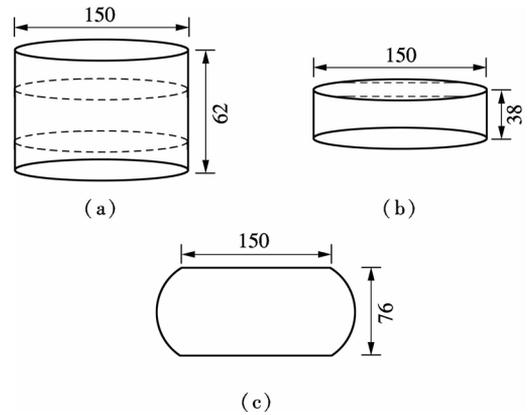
Trimming specimen from molded sample. (a) Molded sample; (b) Trimming specimen's ends; (c) Overlay test specimen (unit: mm)
